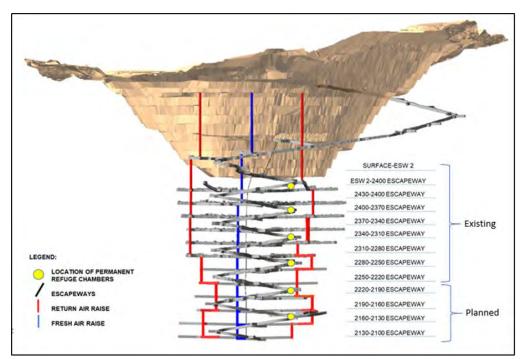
Didipio Existing and Planned Escapeway System and Refuge Chamber Location
